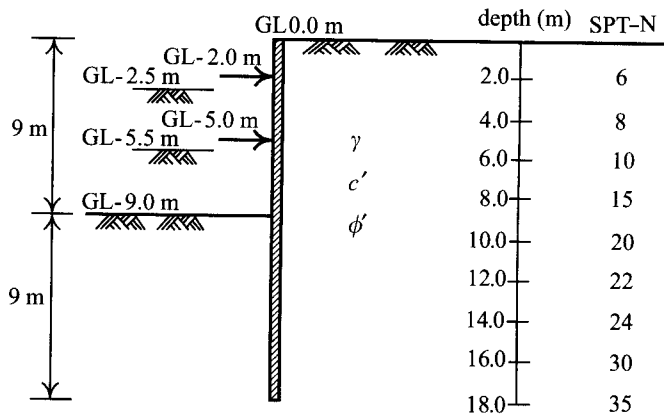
Profile of an excavation in sand and the excavation stages.
